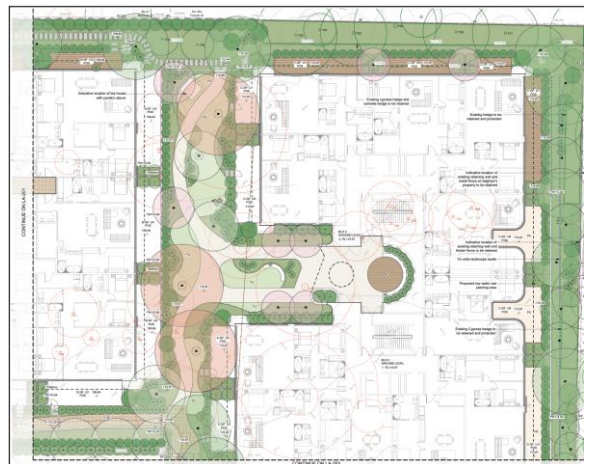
Revised rear landscape plans for Buildings B & C (Studio IZ)
